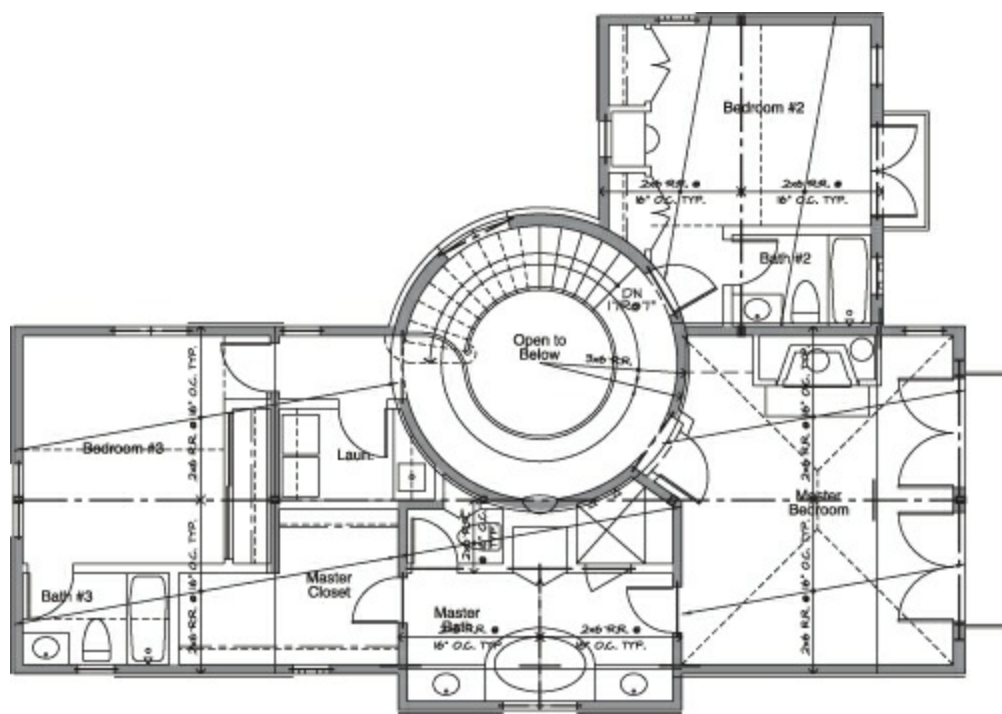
Stage I: Floor plan as datum.
